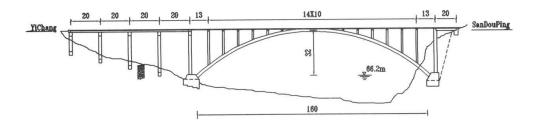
The whole sketch of the Huangbai River Bridge (Unit:m)
